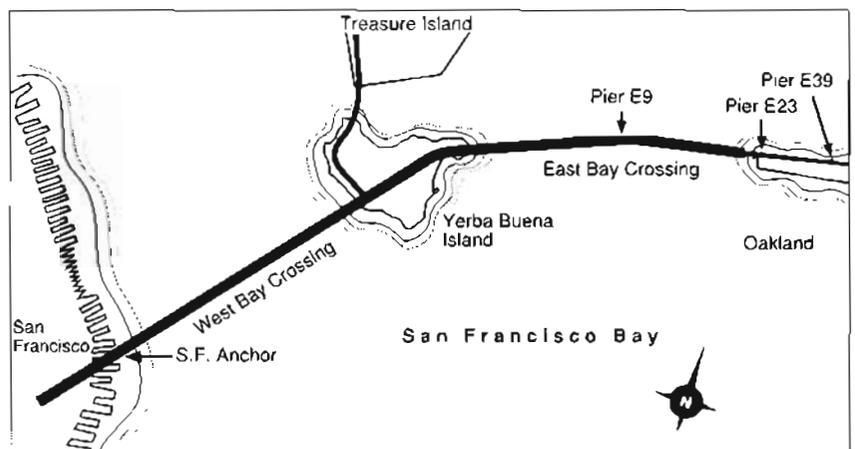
Plan view of San Francisco-Oakland Bay Bridge alignment.
